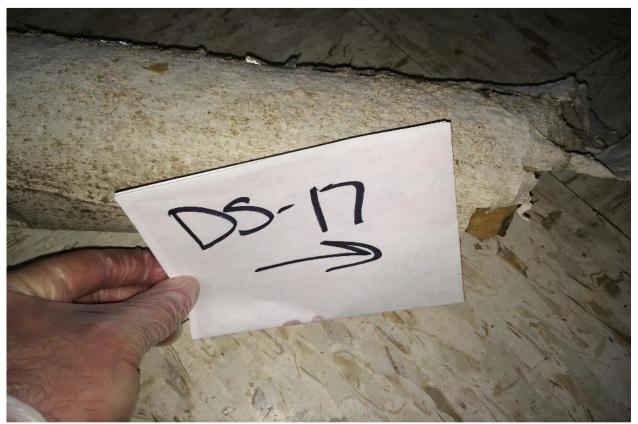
Laboratory analyses did not detect asbestos minerals within plumbing insulation sample DS-17 collected from the Dormitory Building downstairs training room.
